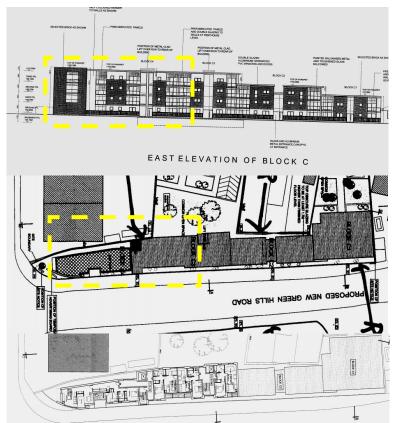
EXCERPTS FROM REFUSED PLANNING APPLICATION, REG. REF. SD04A/0324 (INCL. 4TH STOREY FLOOR PLAN)
